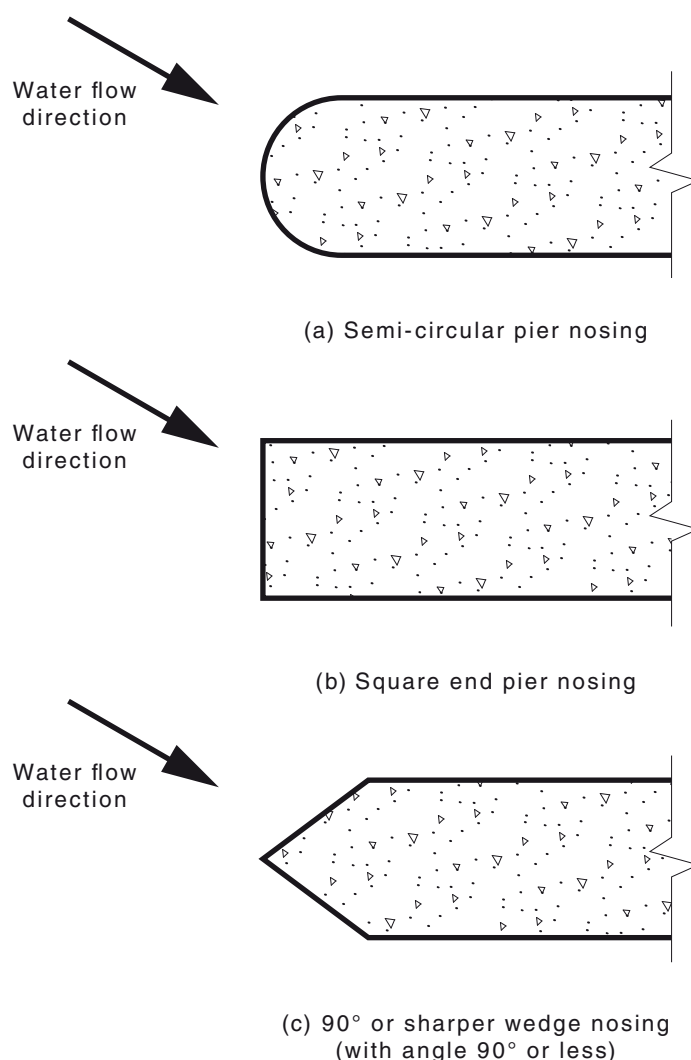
TYPICAL PIER END CONFIGURATIONS
